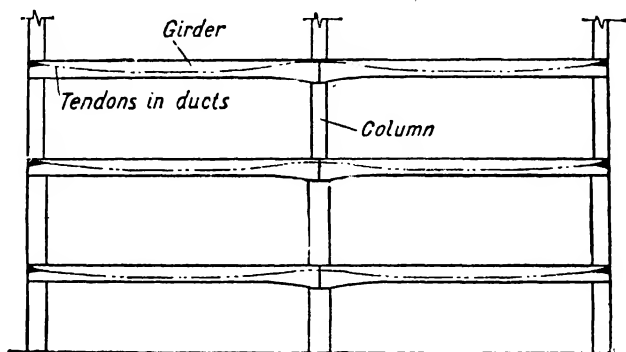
A multi-storey frame with prestressed girders in which the tendons are tensioned against the hardened concrete
